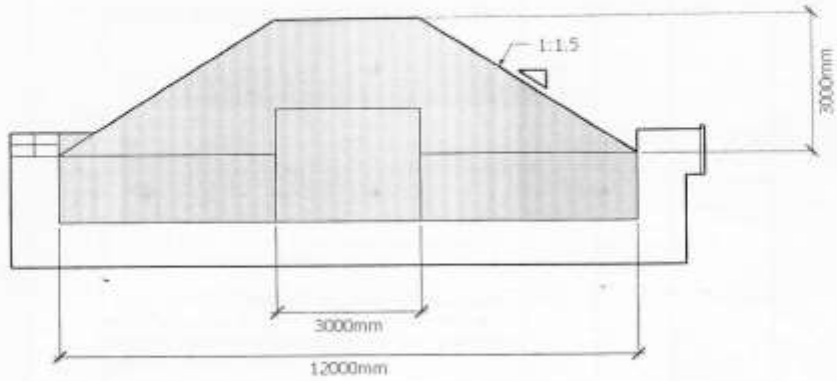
Illustration of Cross Drainage under the dike embankment core with flag gate.
